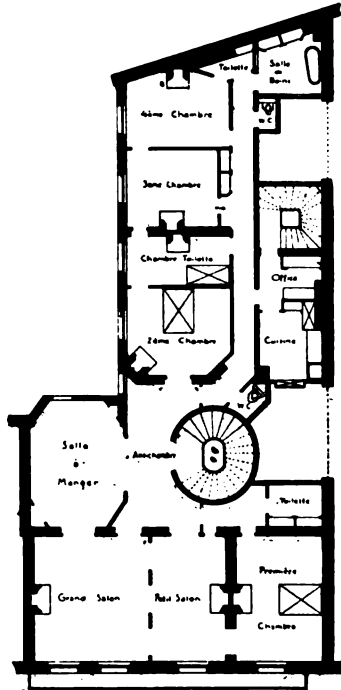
PLAN OF APARTMENT-HOUSE IN THE RUE DÉCAMPS, PARIS. M. POUPINEL, ARCHITECT.
